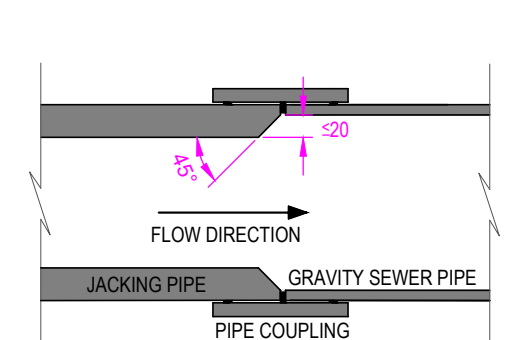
B-F: CC GRP JACKING PIPE TO CC GRP GRAVITY PIPE CONNECTION DETAIL
